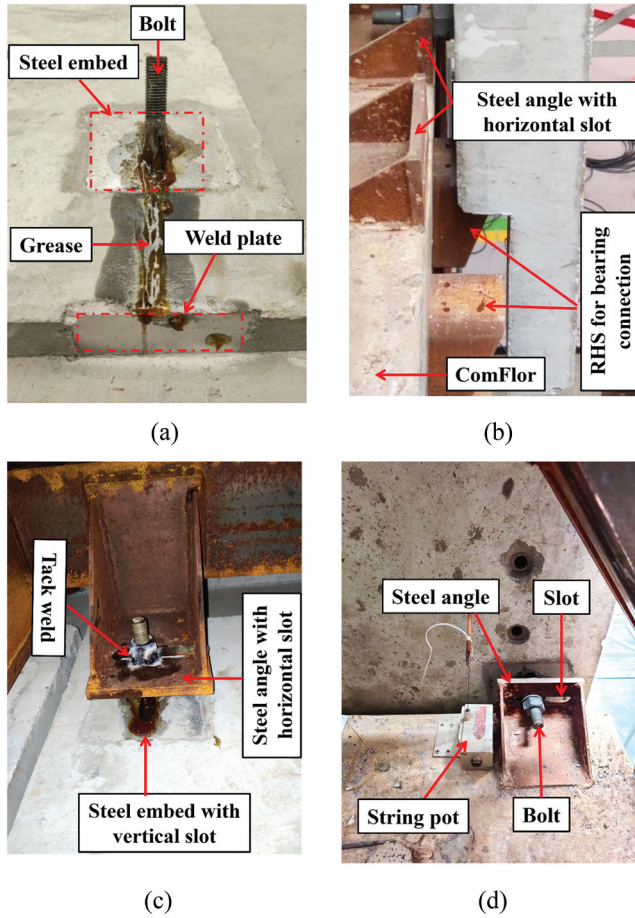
Components of the rocking cladding system: (a) steel-embed and weld-plate; (b) bearing connection; (c) typical tack-welded top connection; (d) typical bottom free connection.
